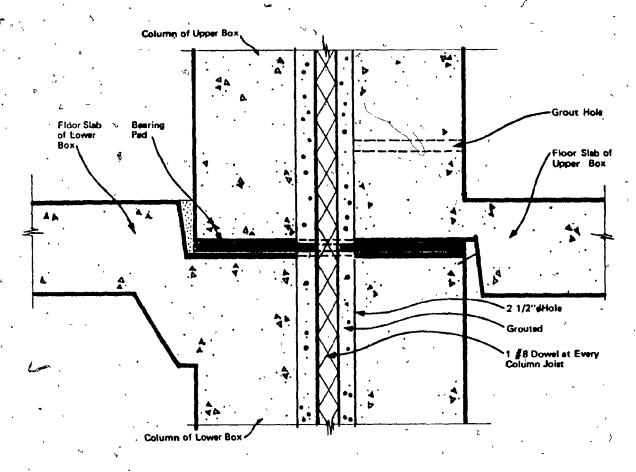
Shelley; Typical Column to Column Joint (Ref. 32)
